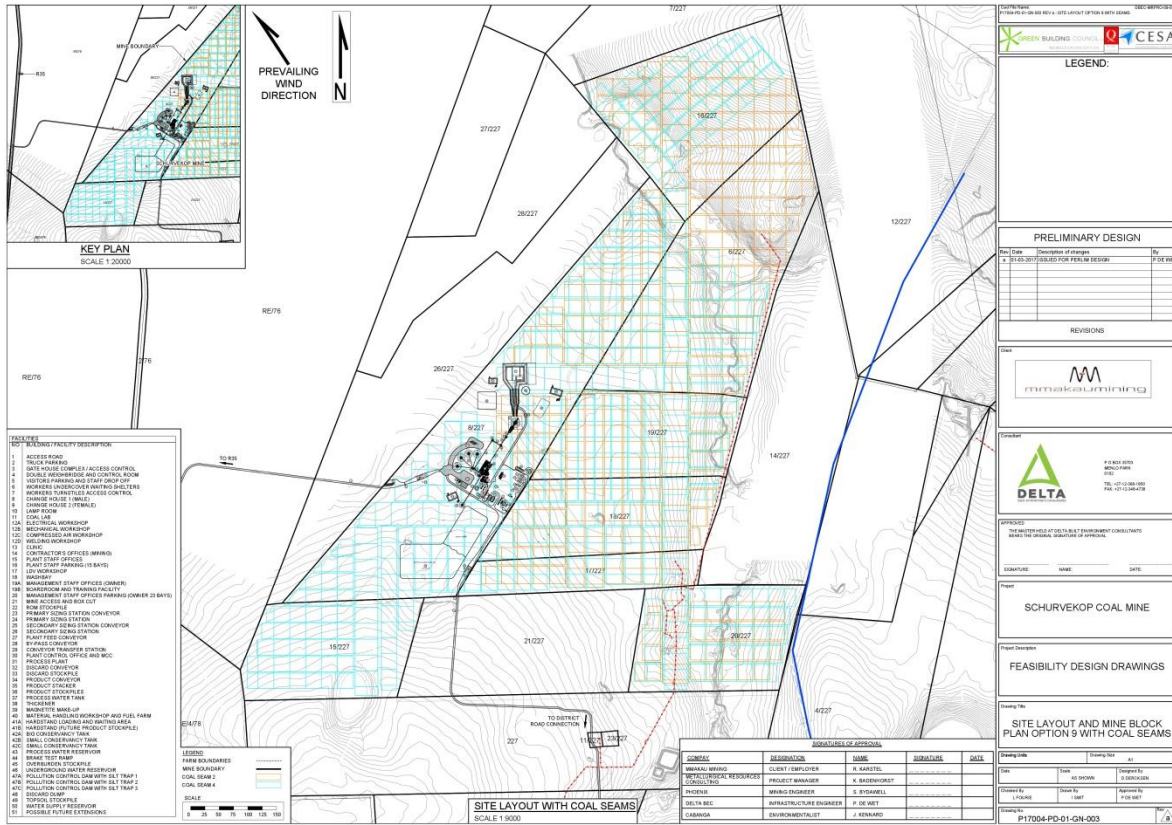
PROPOSED LAYOUT – INFRASTRUCTURE AND UNDERGROUND WORKINGS (DELTA).
